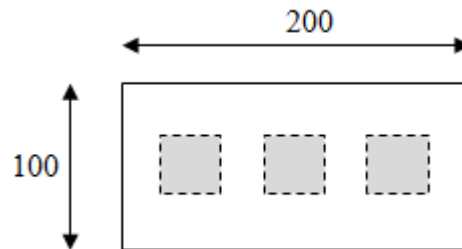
Cutting scheme of the brick specimens (dimensions in mm).
